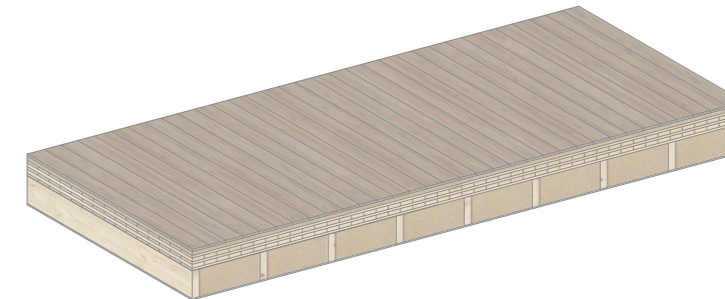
Drawing, Ground-floor slab module. ©Personal illustration.
